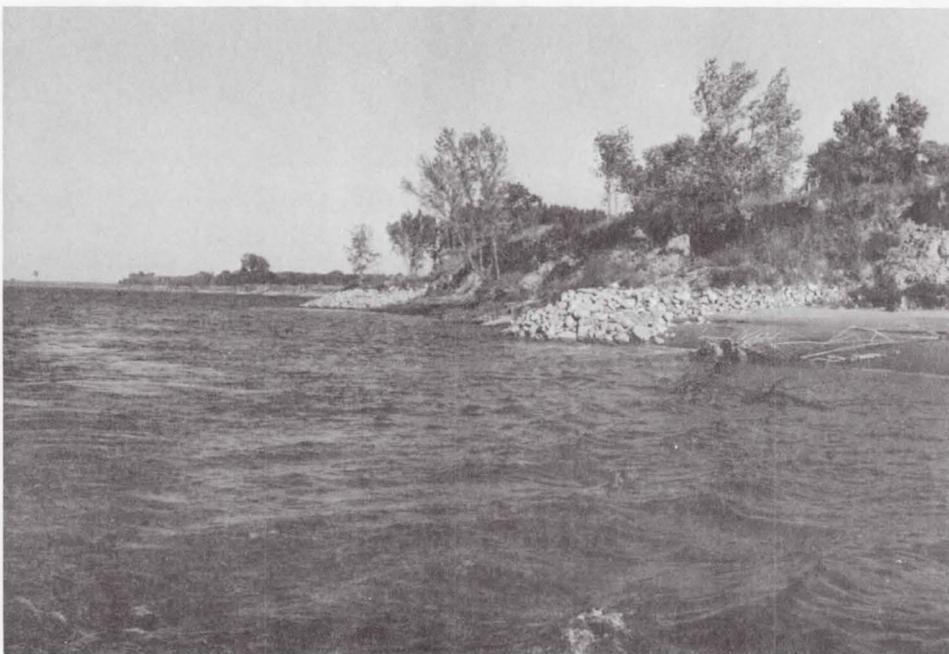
Hardpoints 1366.4 and 1366.3. (Photo taken July 1979)
